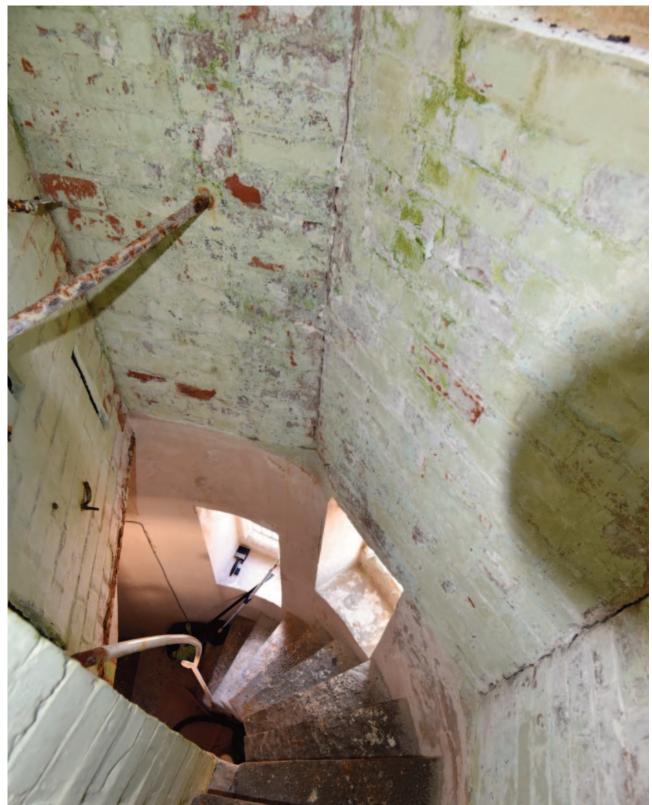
The tower stairs seen from the upper room. The inner face of the walls are lined with brick with steel reinforcing to the stair opening and the tower roof.
